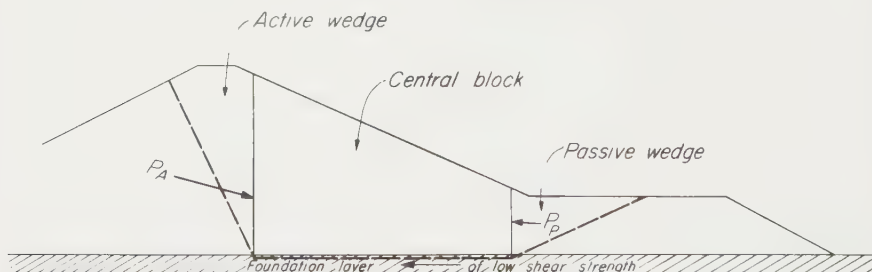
Sliding-block method of stability analysis, dam with counterweight berm situated on foundation of low shear strength.
